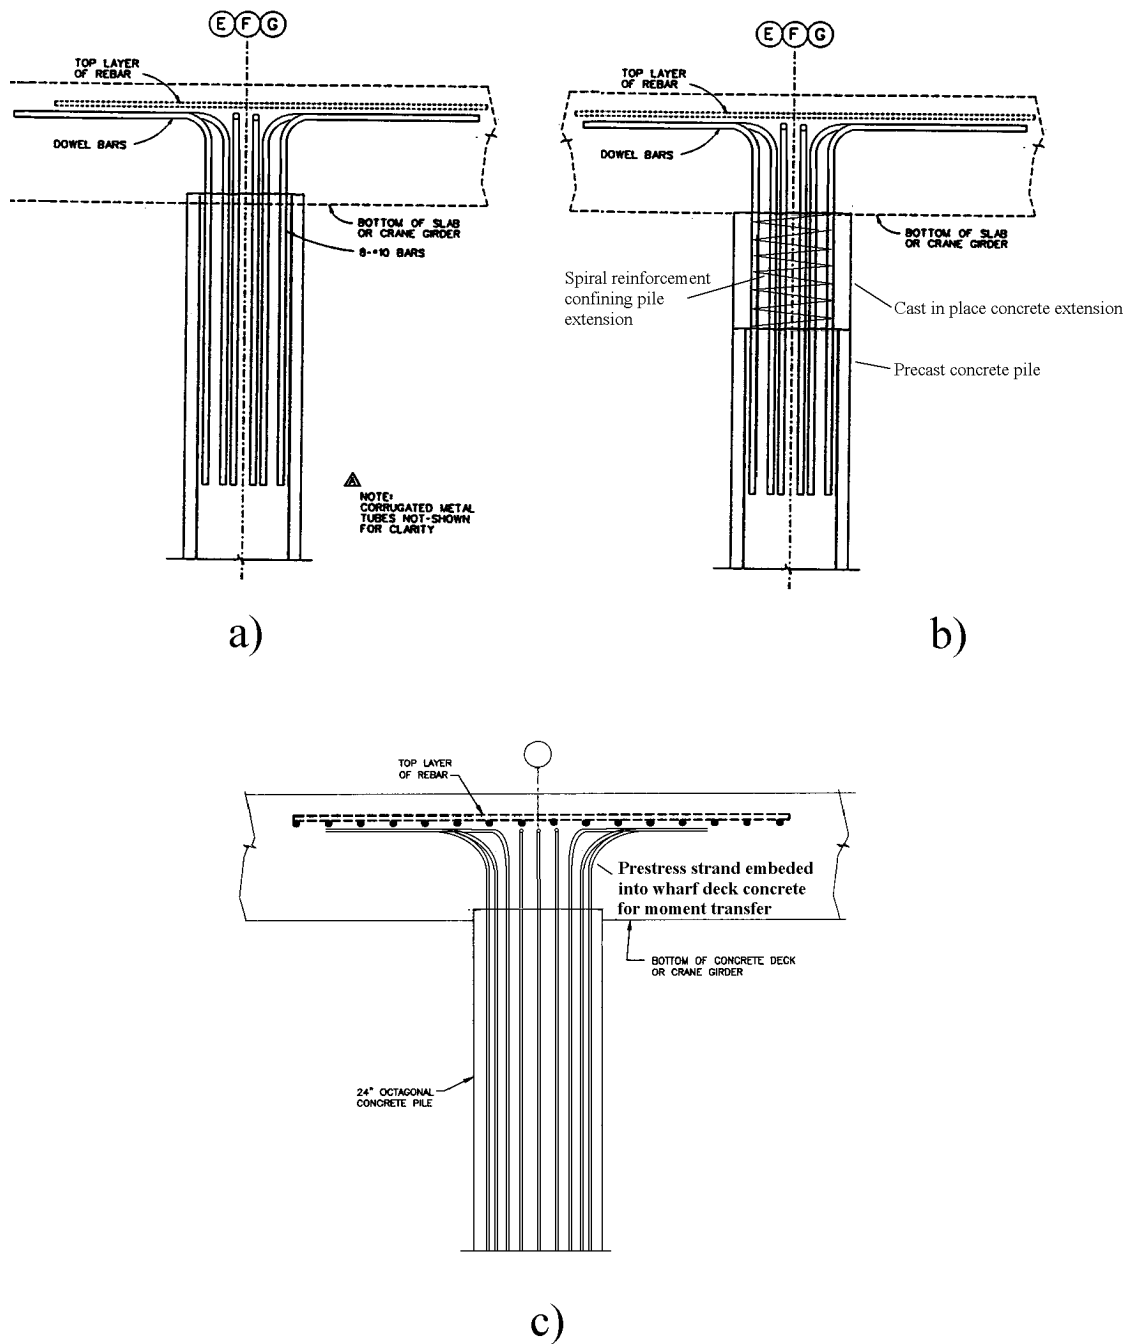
Typical Prestressed Concrete Pile Moment Connections; (a) Outward Bent Dowel Connection; (b) Extended Outward Bent Dowel Connection; and (c) Extended Strand Connections
